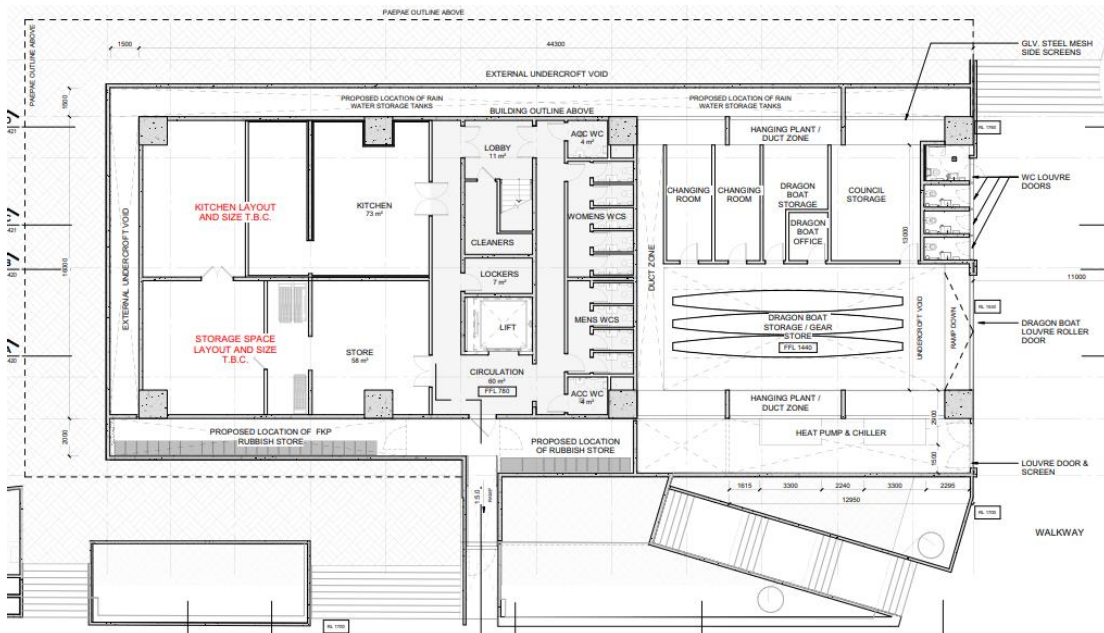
Floor Plan (Basement Level) - Application Drawing RC-100
